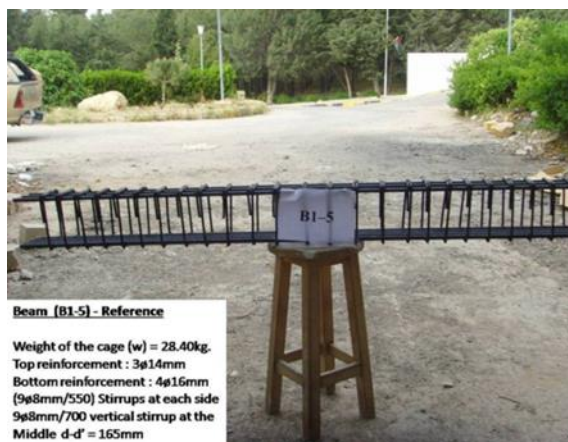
Steel Cage Reinforcement of Beam 'B1-5
